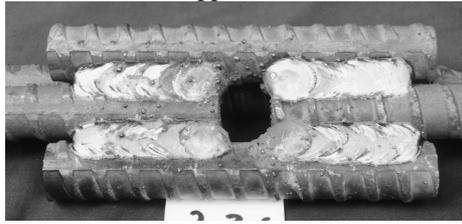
Macro of internal fillet weld alternative of plate - reinforcement bar joint
